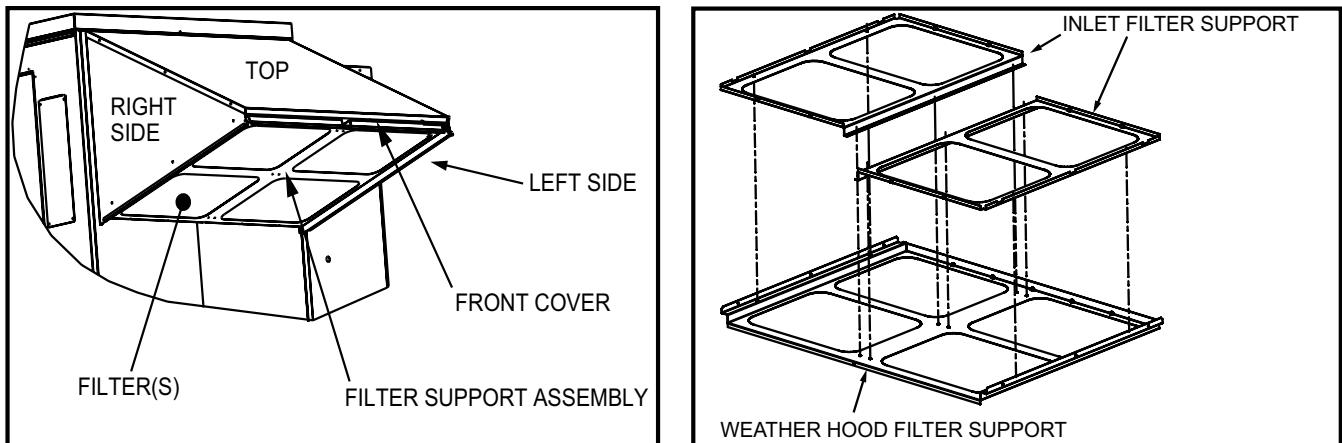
Outside Air Hood Assemblies (Refer to [Table 28](#))
